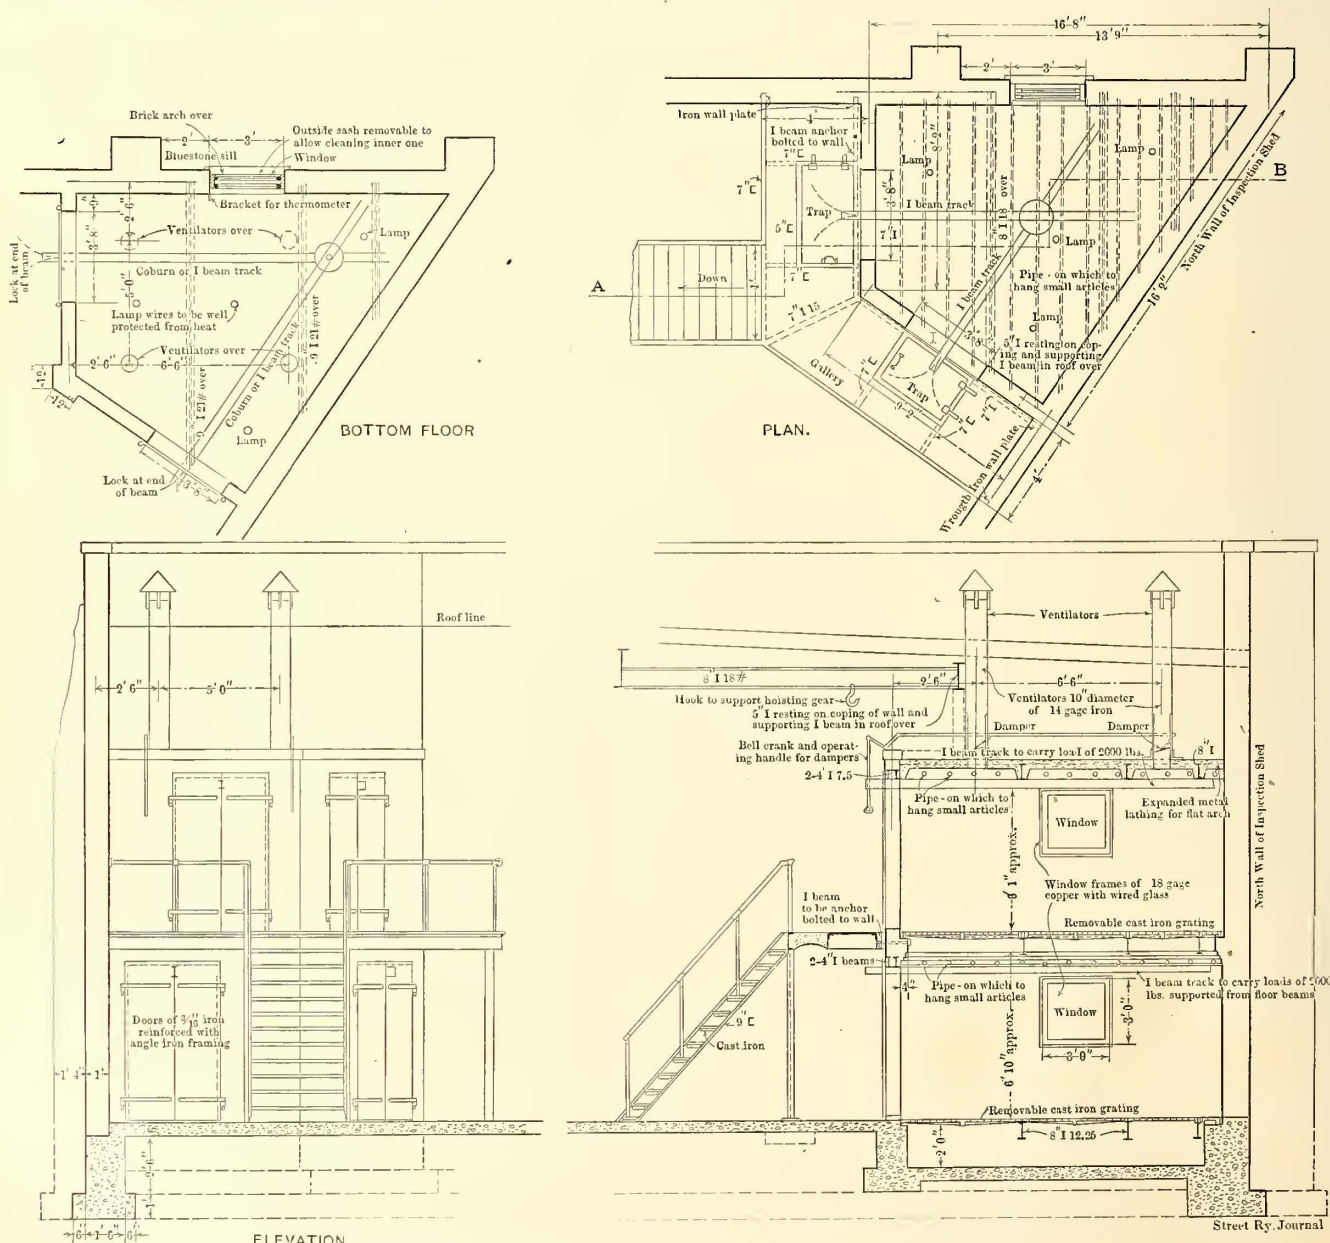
ELEVATION, SECTION AND PLANS OF ARMATURE OVEN
